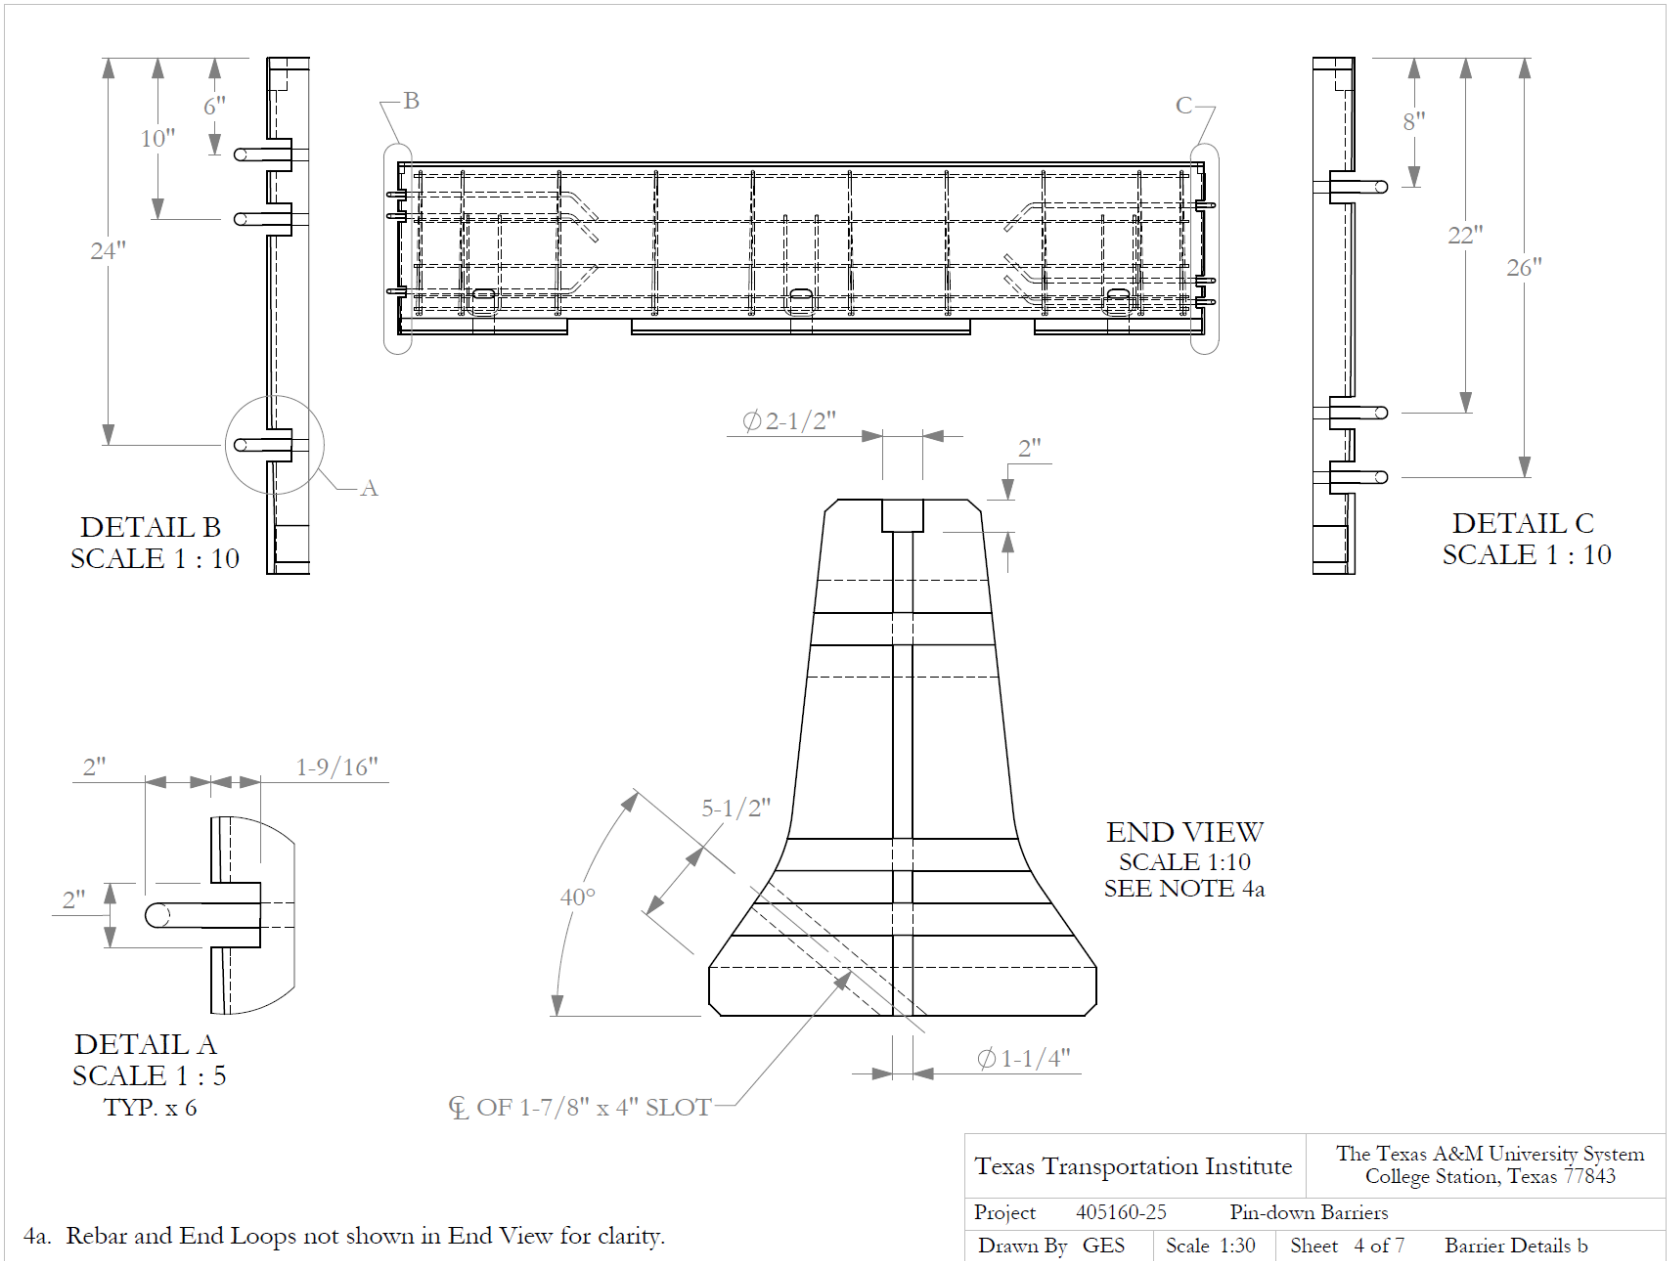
Barrier details for the Temporary Concrete Barrier Pinned on Asphalt.
